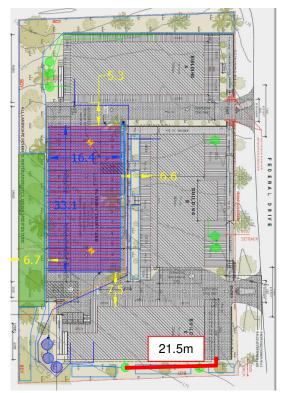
Greatest distance between a trade waste tank and pump out truck access point.
